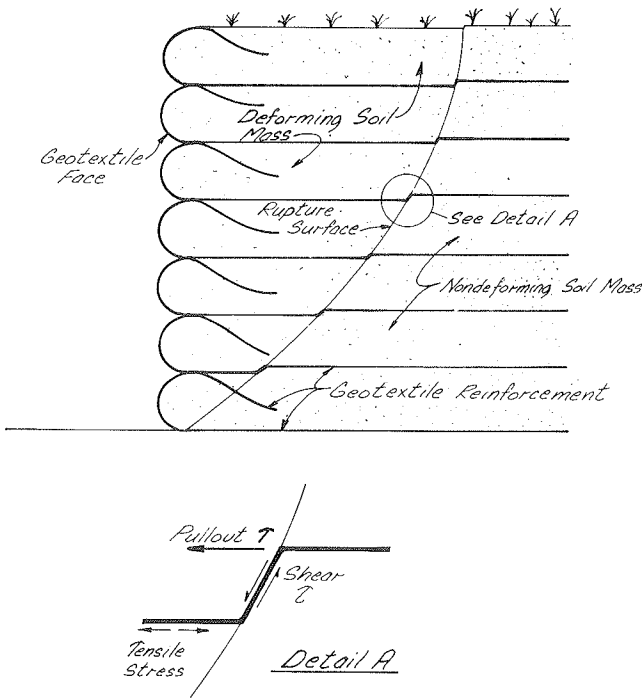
Failure mechanism of geotextile reinforced wall.
